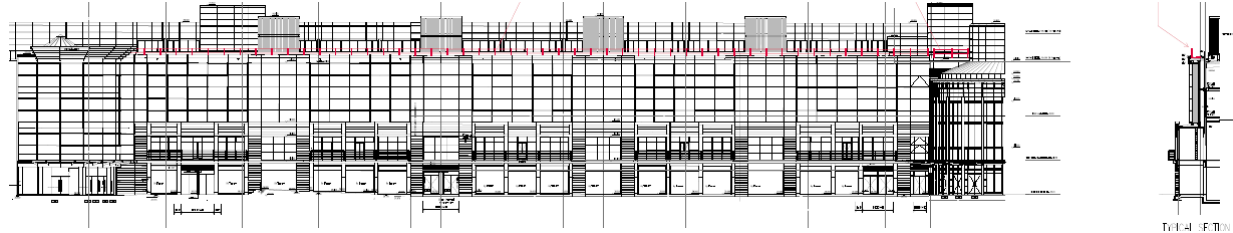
Proposed south elevation of The Oracle building to the north side of the Kennet visible from The Oracle riverside area (additions shown in red)
